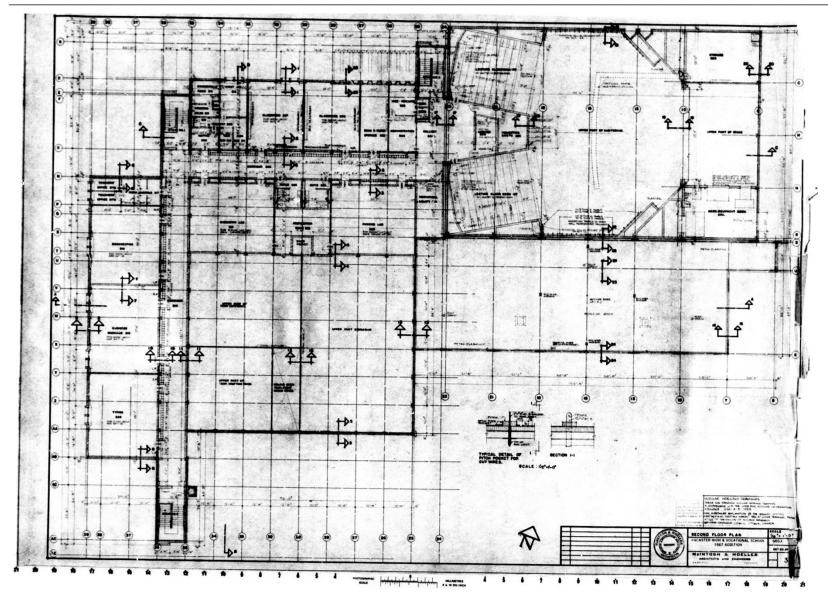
Ancaster High – McIntosh & Moeller, Second Floor Plan, West Wing Addition (Auditorium) 1967 (Slide 41-114: Provided by Hamilton Wentworth District School Board Archives)
